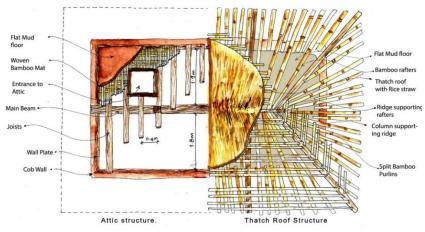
Roof structure and plan with details of materials (Source: Thanal)
